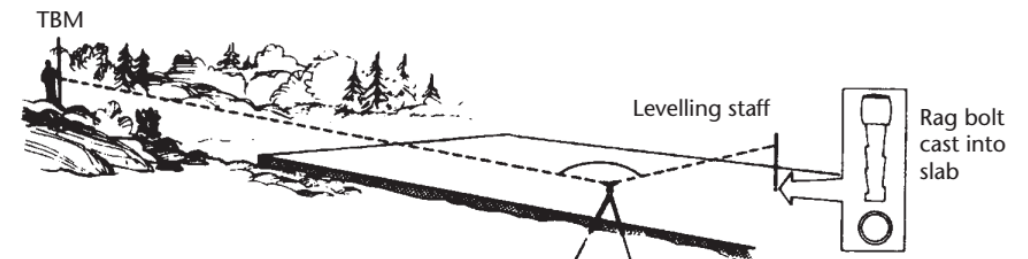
• Transferring horizontal control to a ground floor slab.
